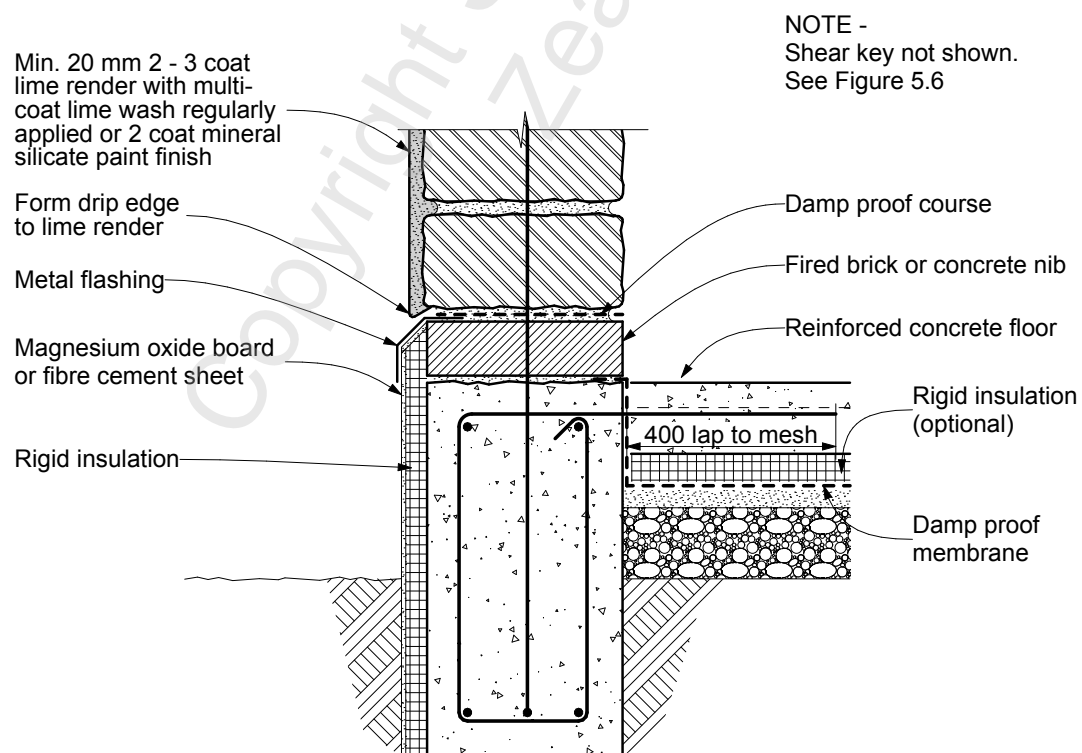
Footing – Insulated footing and slab for lime render over solid earth wall
